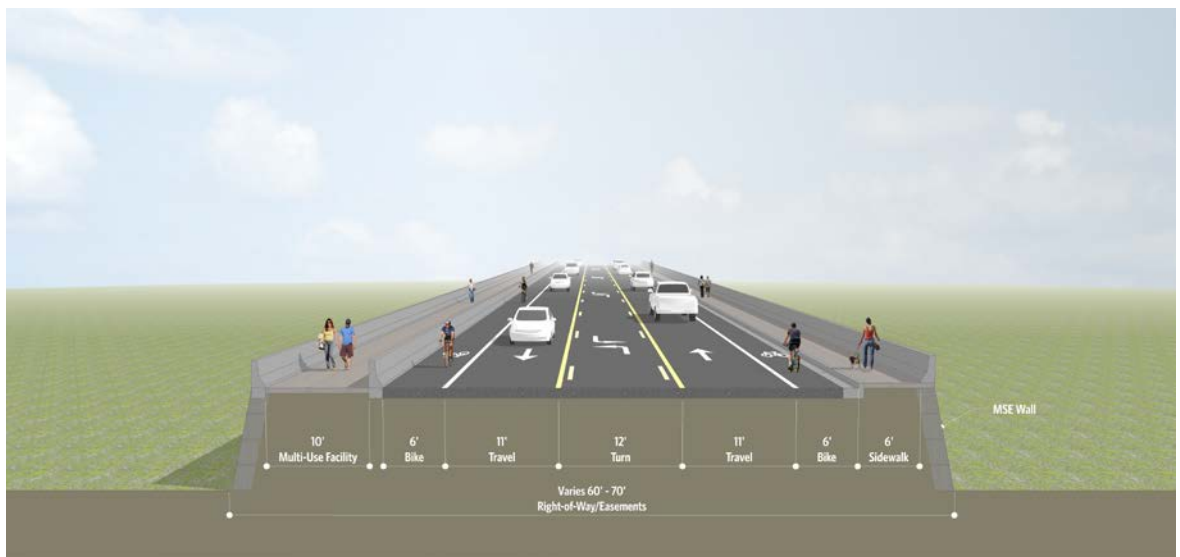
32nd Avenue at West End of BNSF Railway Overcrossing
